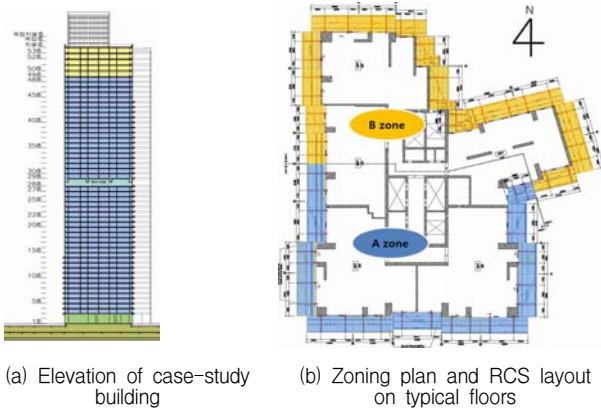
Elevation and Rail Climbing System (RCS) layout of case-study building
